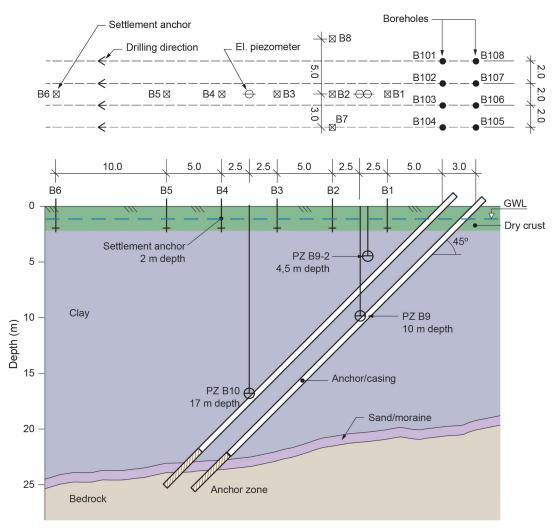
Layout and cross section of instrumentation for each drilling method (example from Area B).
